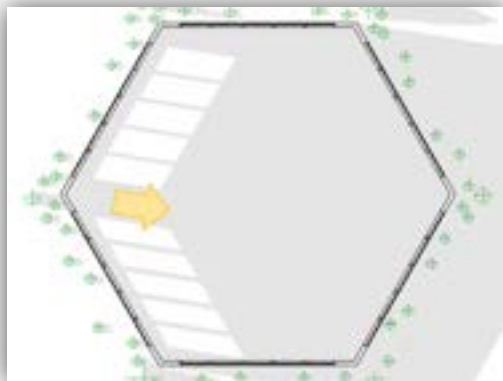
plan view at 9:00 PM (21:00) on June 21st (Summer Solstice) with slab-to-slab windows and two-foot roof overhang. Source: primary.
